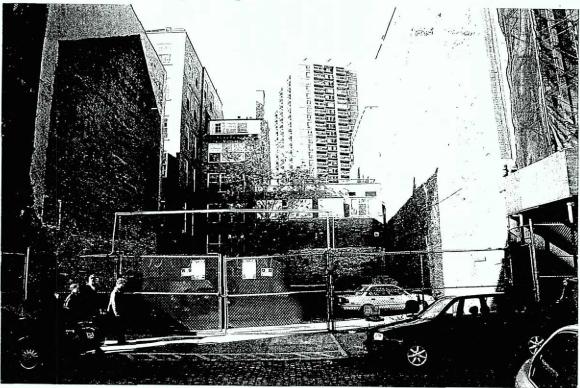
View of project site lots 41 and 40 from Front Street looking north.
